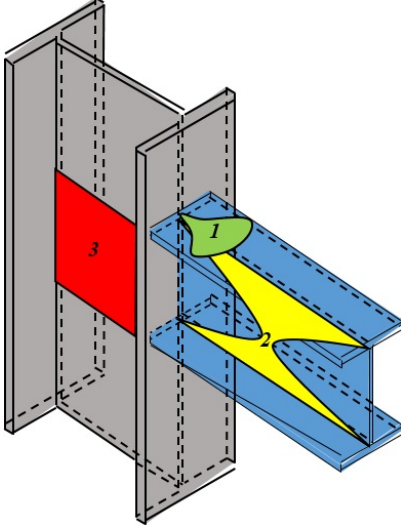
A schematic of an exterior beam to column joint depicting the three probable yield locations
